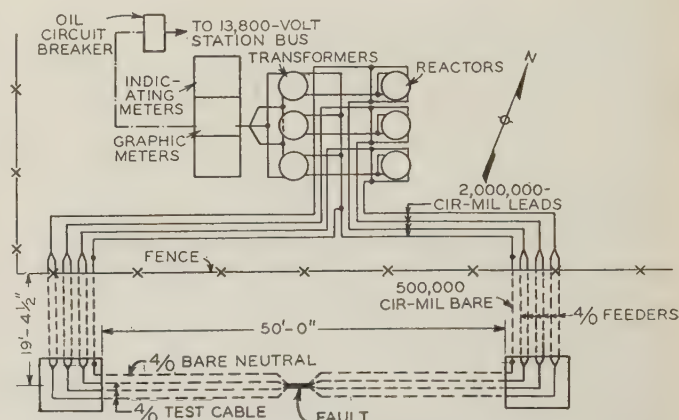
Plan showing electrical layout for conducting tests on cables at No. 5 substation
